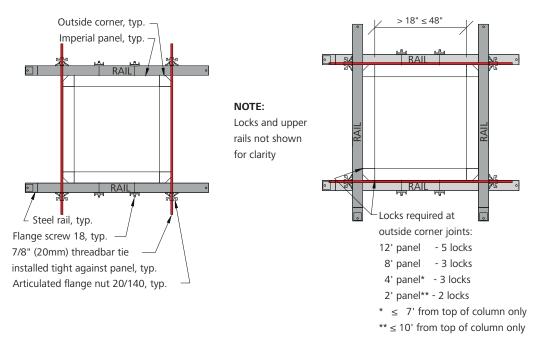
Columns > 18" but \leq 48" with strengthening collars - plan views
